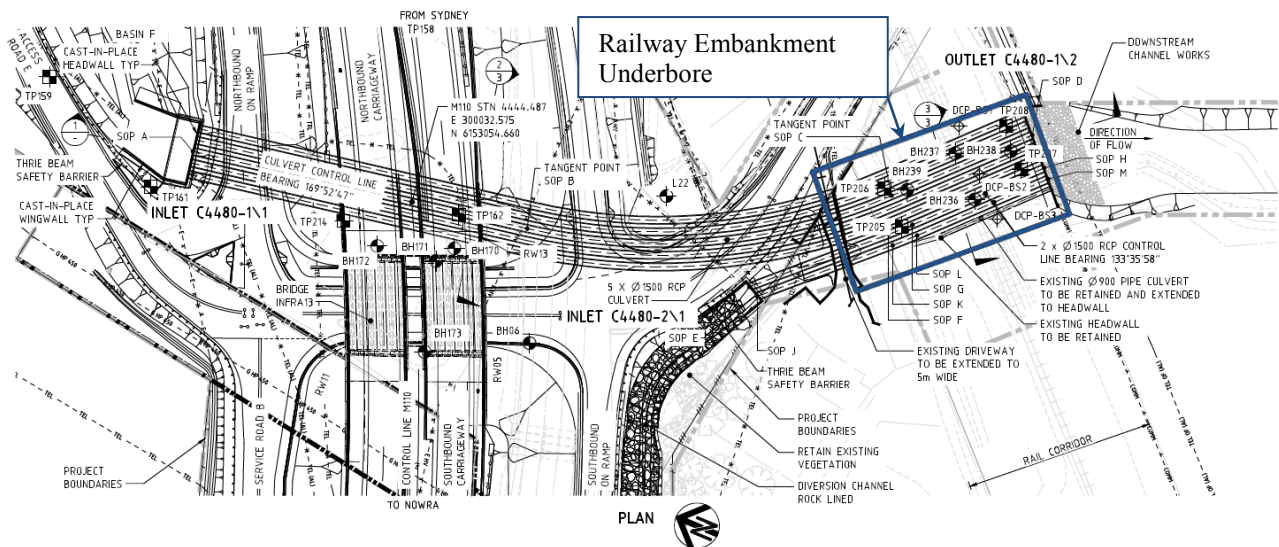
Gerringong Bypass Belinda Street Culvert C4480 alignment plan.
